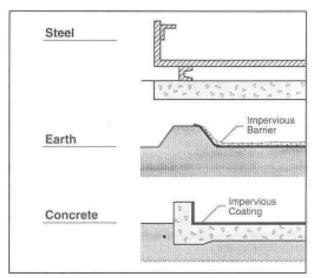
Typical Dike Sections. Dikes may be constructed of steel, earth or concrete.
